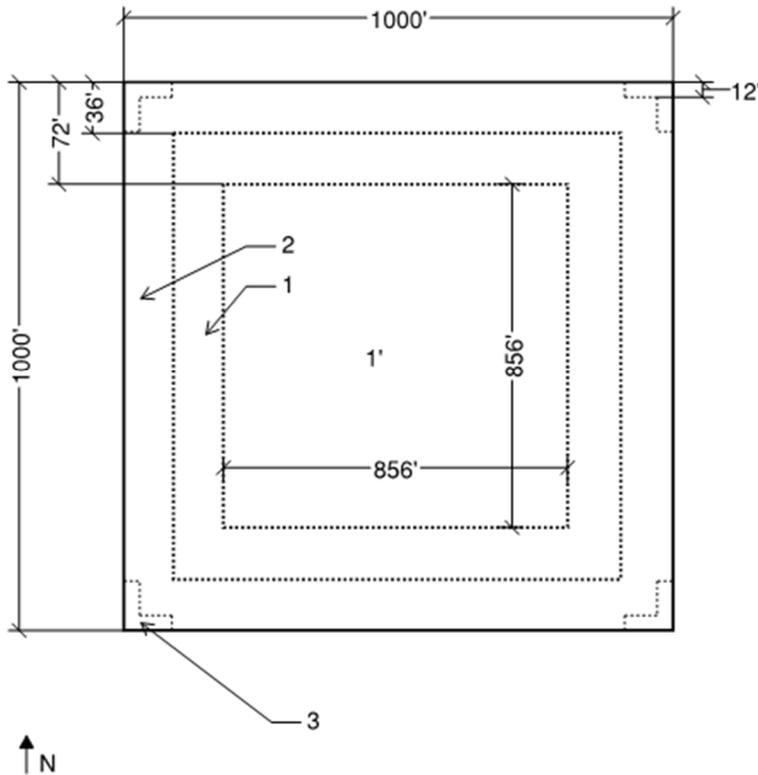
Plan View of Power Plant with C&C Zones (NTS)
